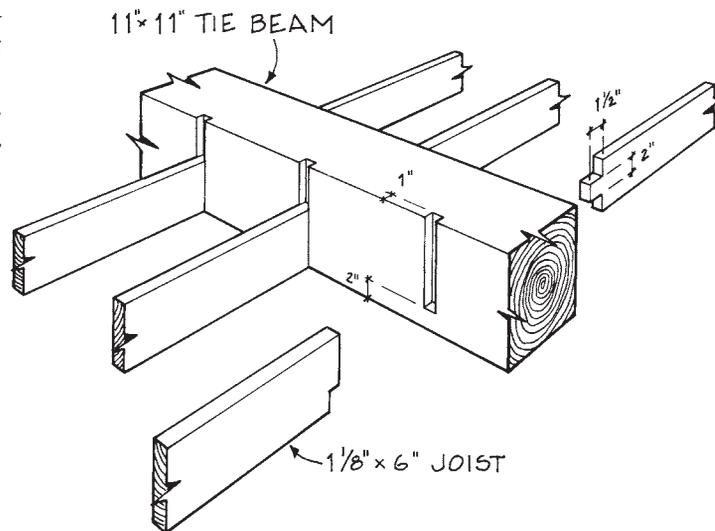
(left). Long pulley (chase) mortises were cut in the tie beams for every three ceiling joists in the Hatfield, Massachusetts, Meeting House (1750). The opposite side of the ties had simple 2x3 mortises. This building was destroyed while being rolled to a new site in 1979.
